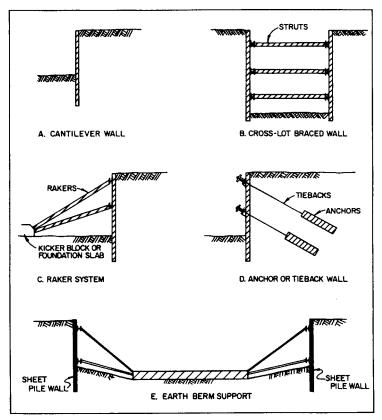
Common types of retaining systems and braced excavations. (From NAVFAC DM-7.2, 1982.)
